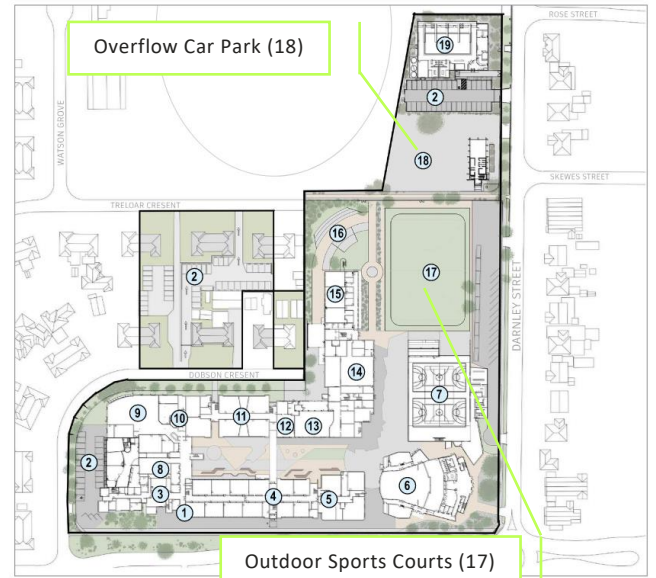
2.1.2 Ground Floor (source: CCCC Masterplan prepared by Watson Young Architects, dated 23.03.2023)
